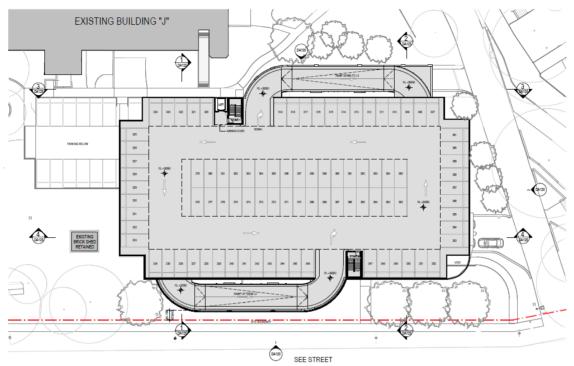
Level 4 Floor Plan (Source: Gray Puksand)
